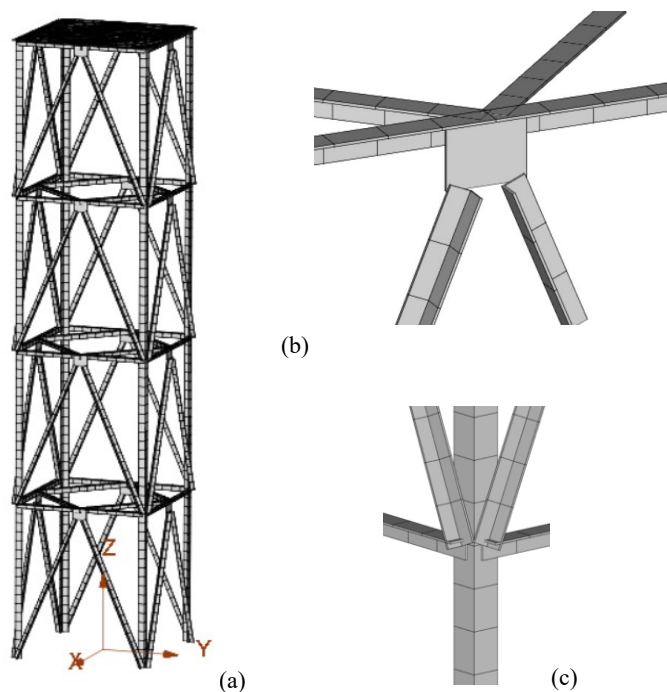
(a) 3-D tower model, (b) Detail of the connection between horizontal and vertical bracings, (c) Detail of the connection between vertical bracings and leg
